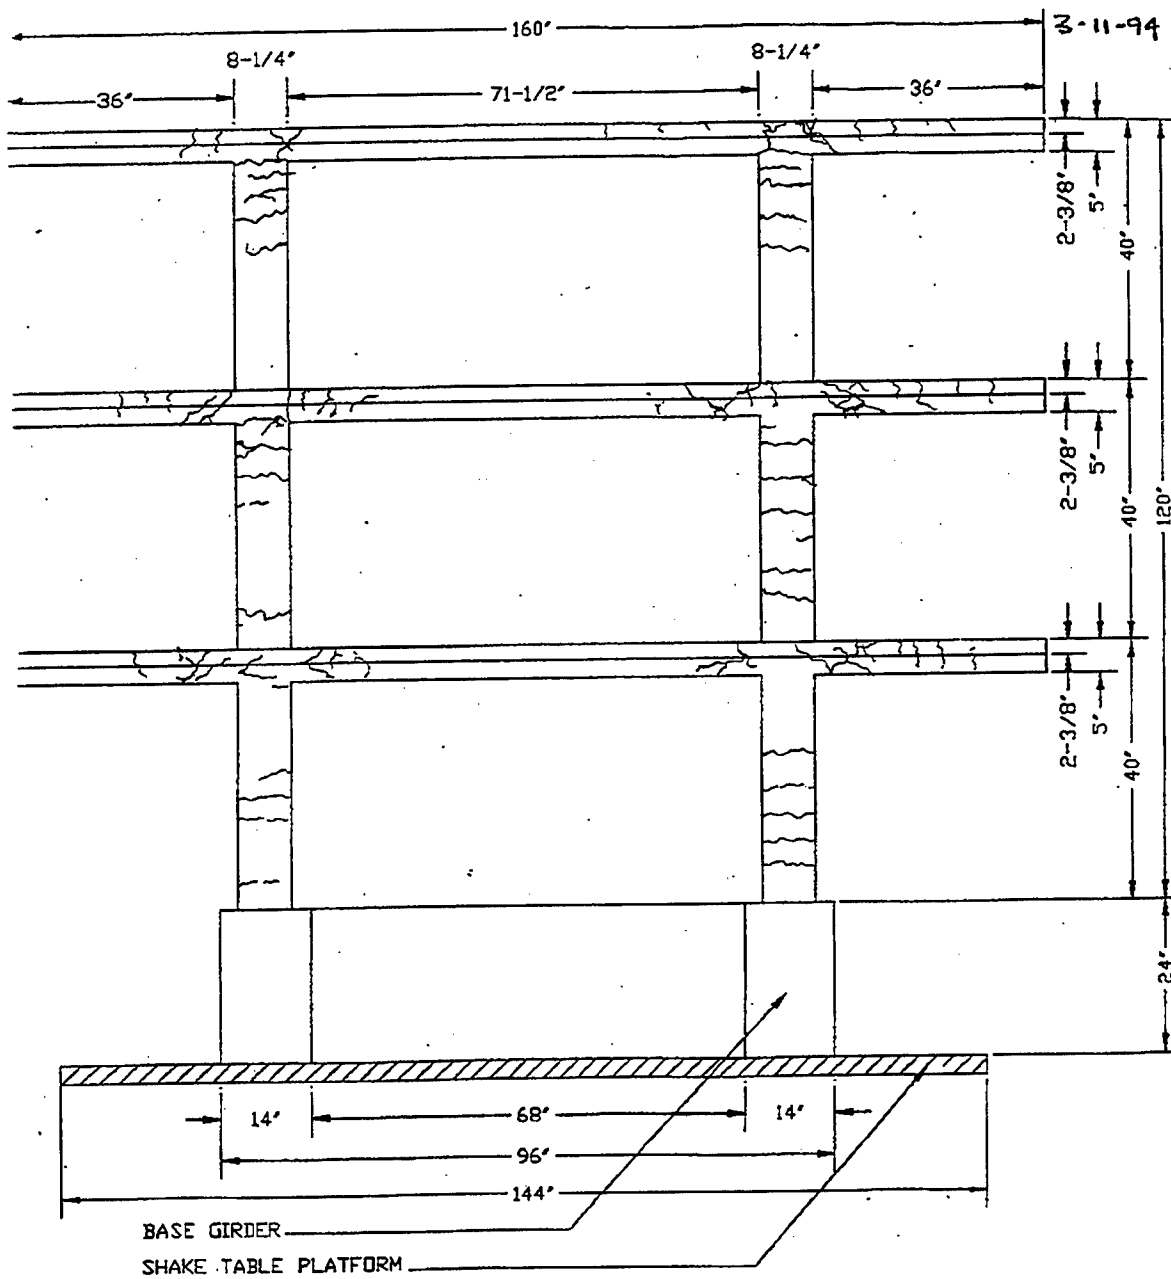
Crack Pattern, North Side of North Columns, Post-T420DL
